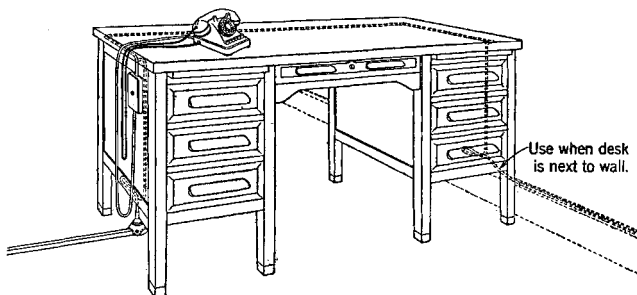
Typical Installation with Telephone Set on Aisle Side of Desk
